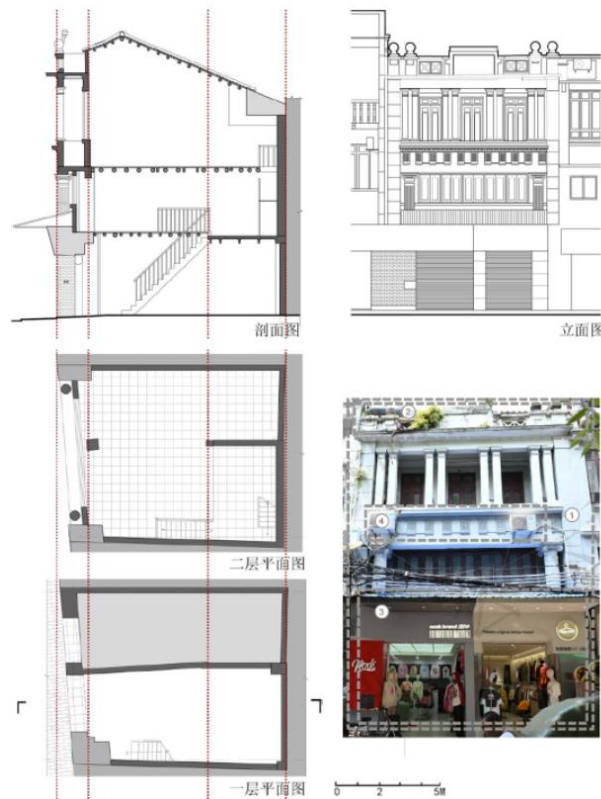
Plan, Elevation, Section and Current Situation of No. 121 Guangfunan Road
